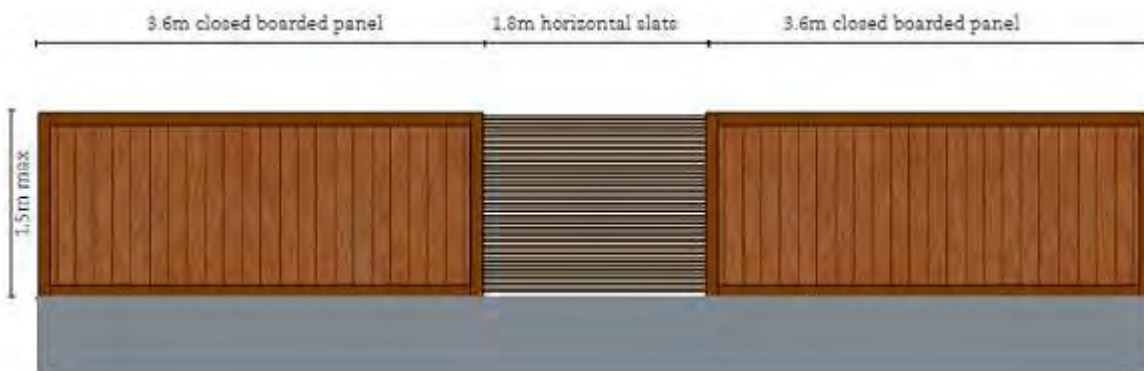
Fencing Detail 3 - Public Open Space - Conservation
